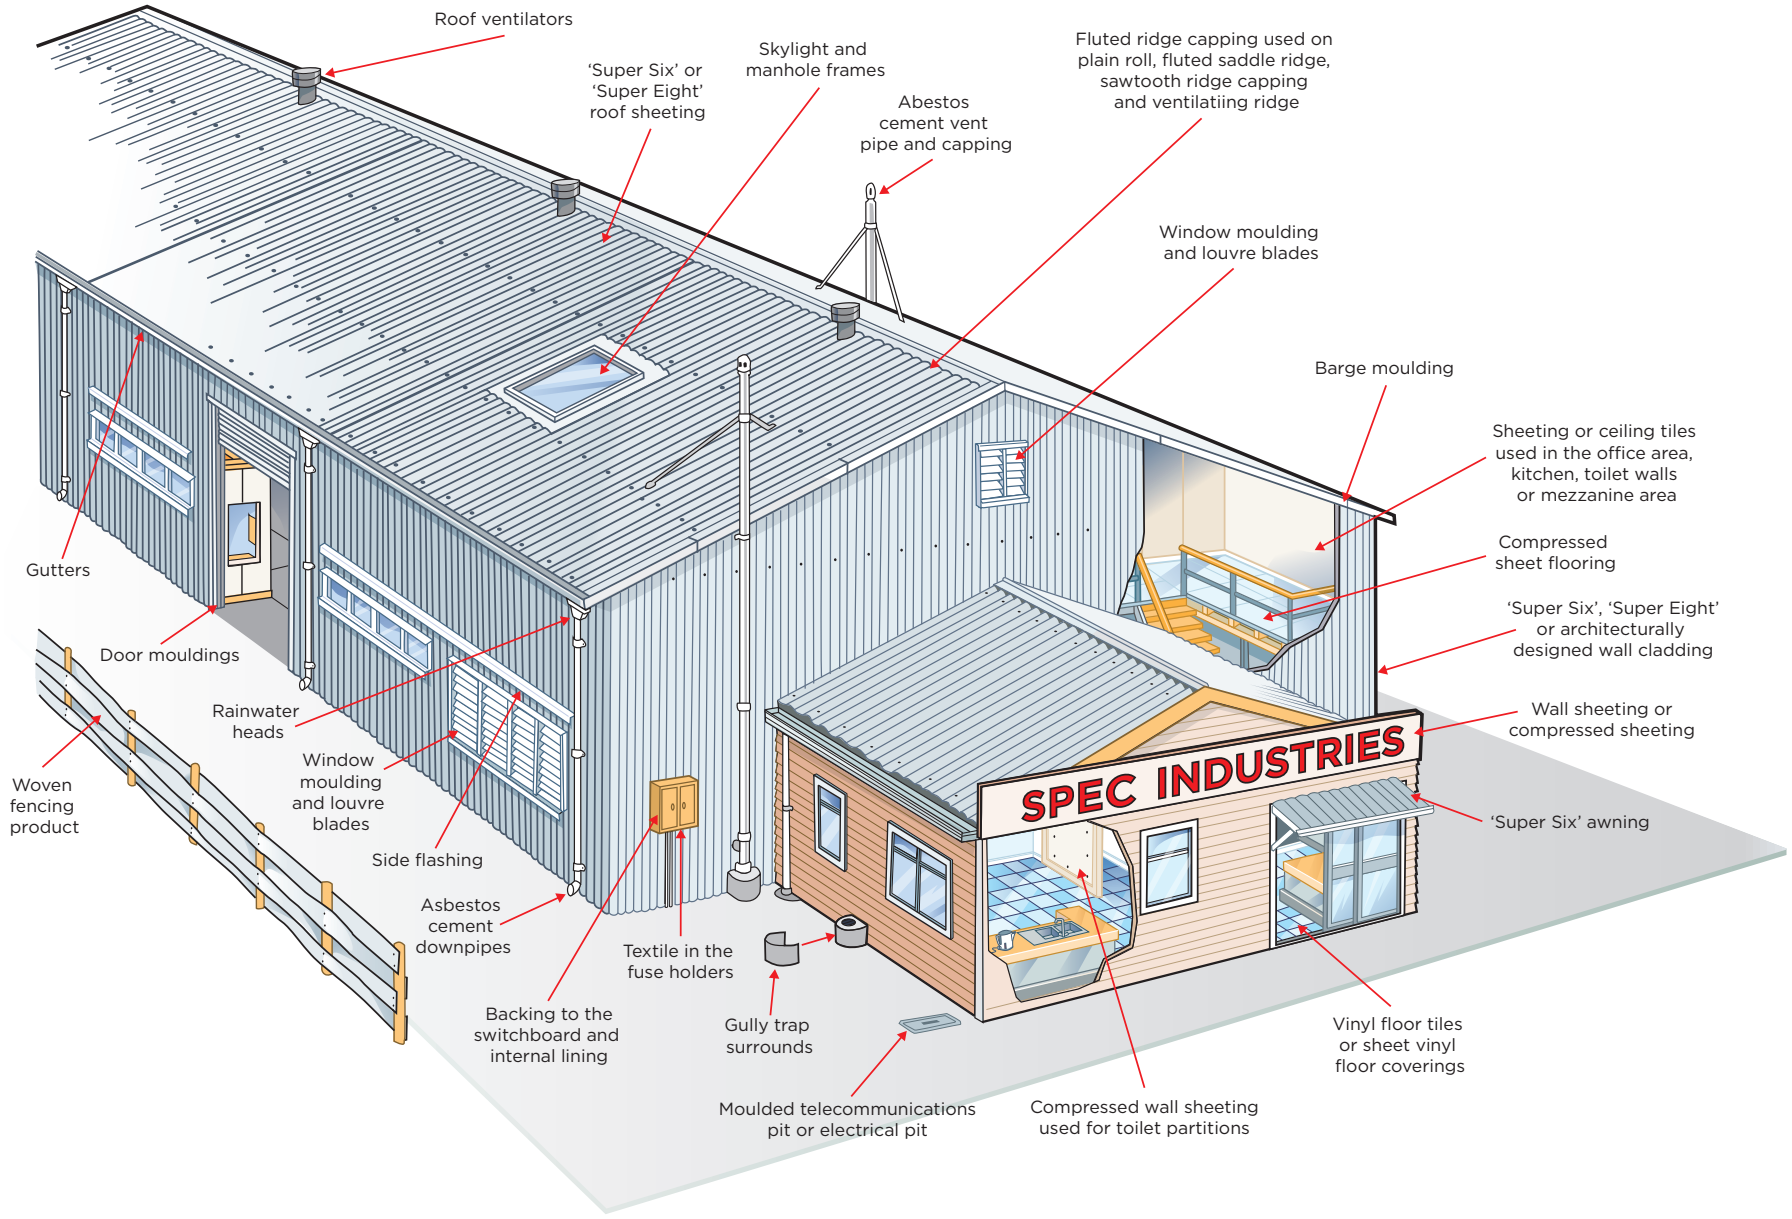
Potential locations of asbestos in an industrial building built before 2000
